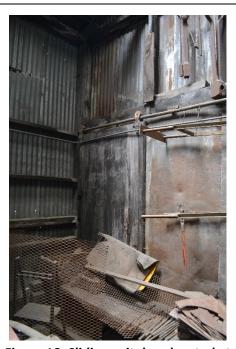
Sliding exit door located at the interior of the rear shed's southeast corner
